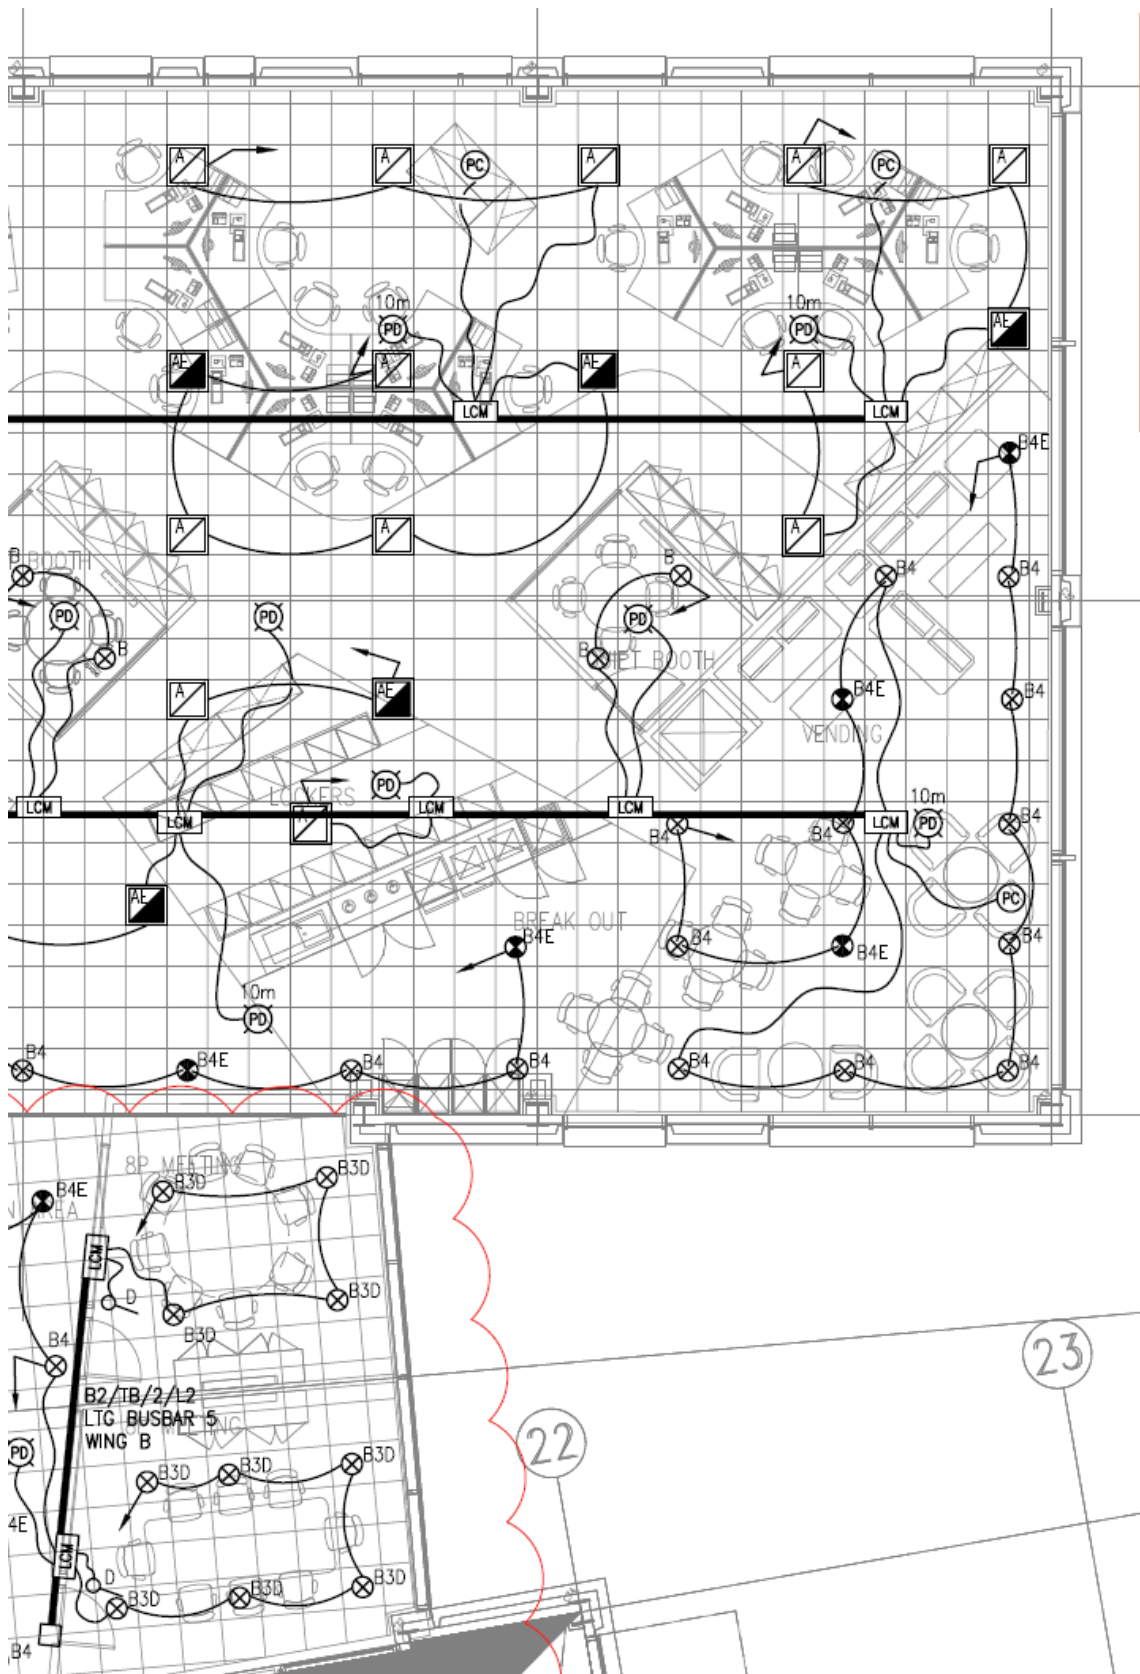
A portion of a building drawing that details an open plan office, canteen area, light fittings and nodes.
